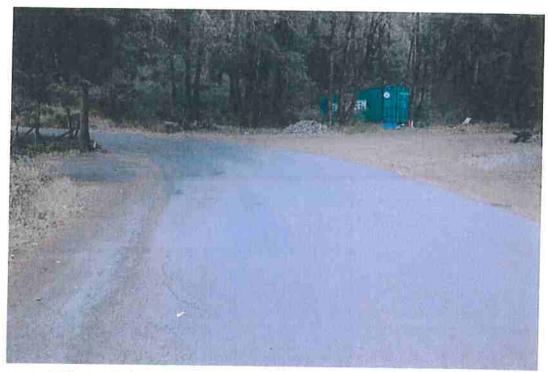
Mile 0.6: 24-ft road width with 2-ft shoulders.
